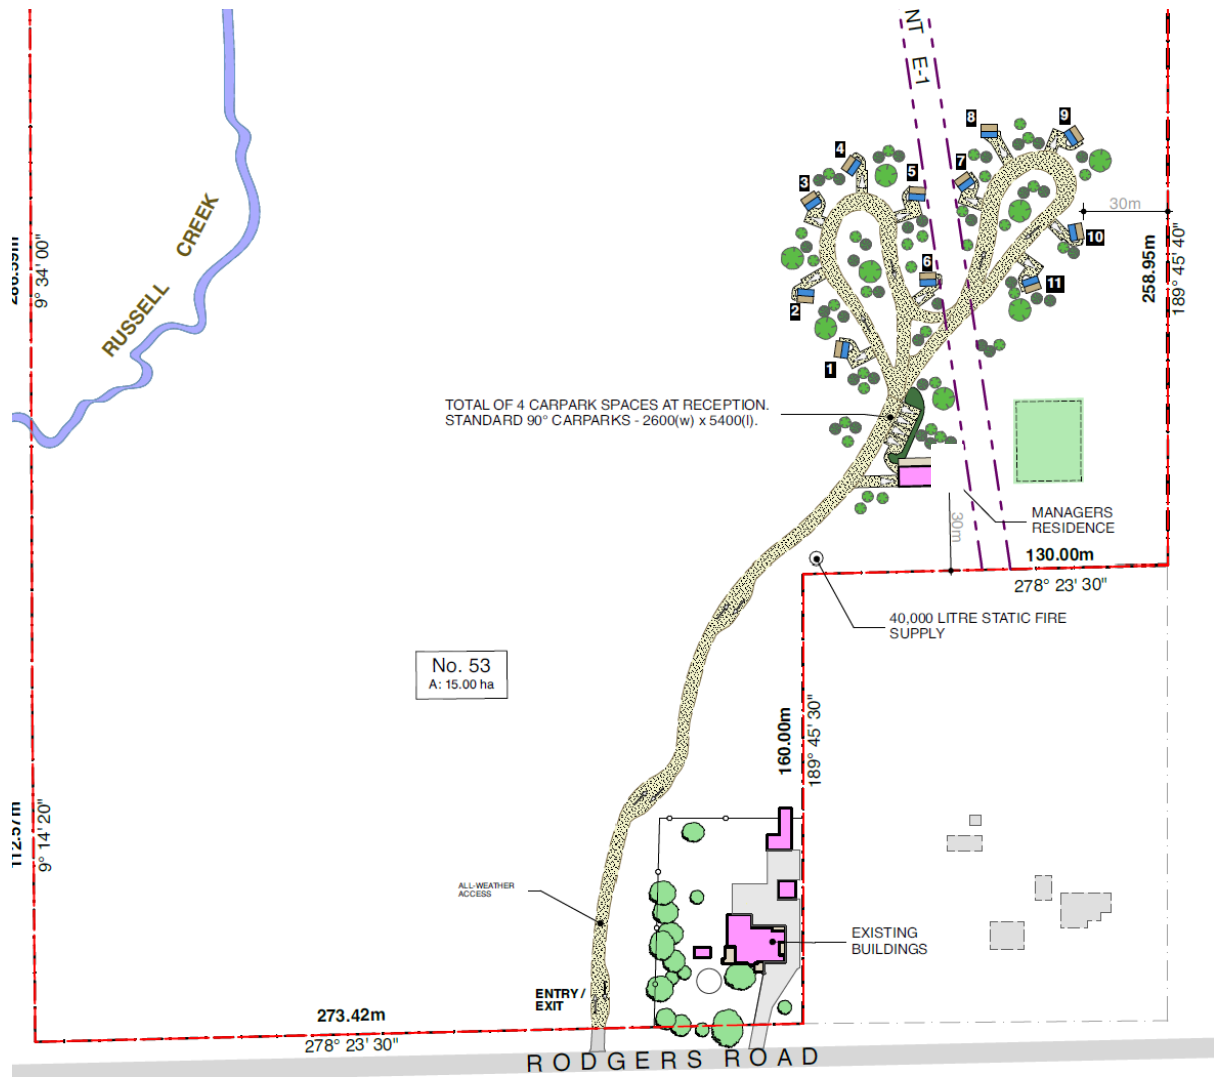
SITE CONTEXT PLAN (SOURCE: MPAA STUDIO)
